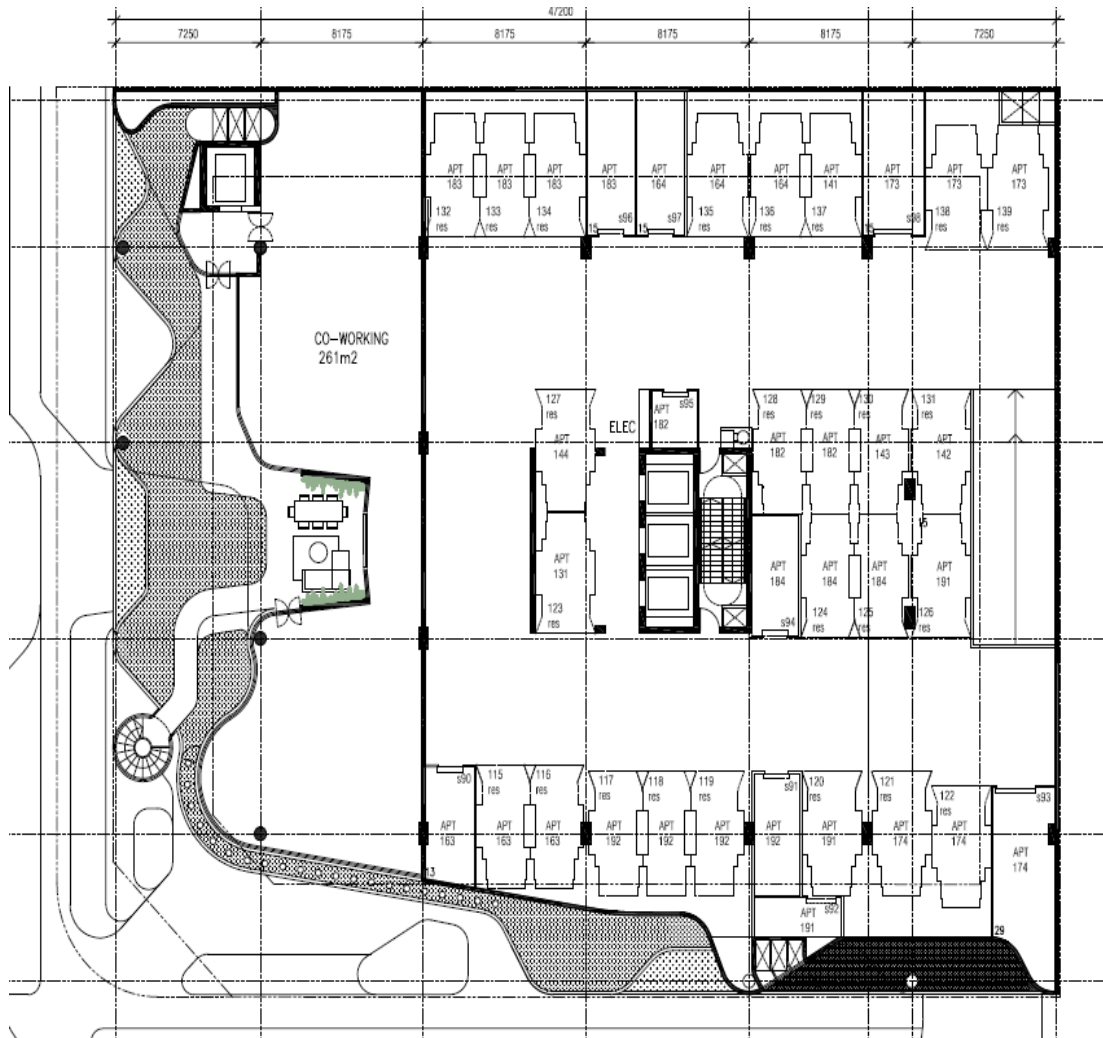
Floor plan for Level 1 of podium presented at December Canning Bridge Design Review Panel Meeting with car parking and 261m² of co-working space
